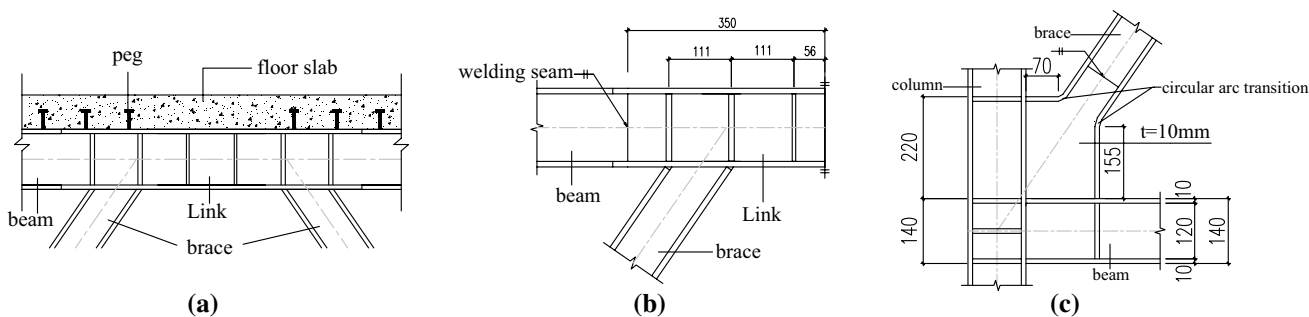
Details of specimen. a No shear studs in link, b Connection between beam and link, c brace joint
